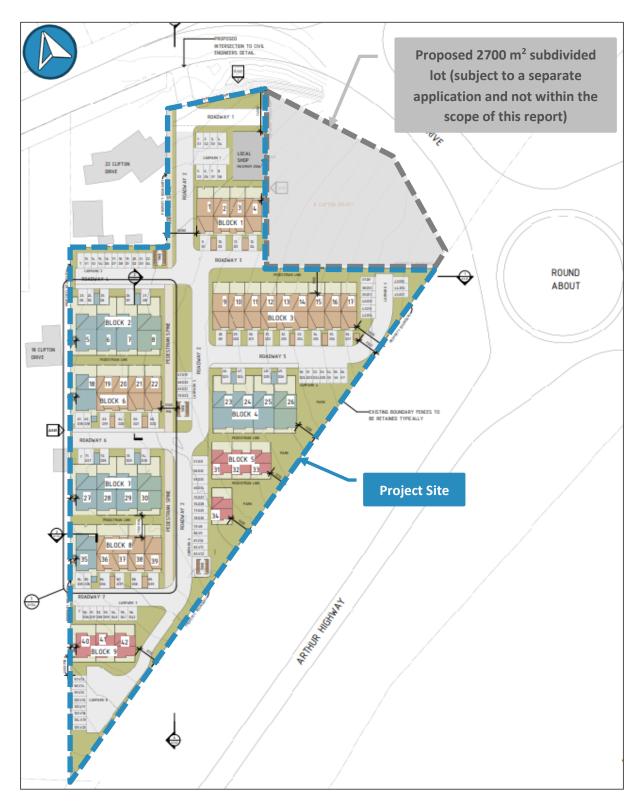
Proposed Site Plan (Image Source: 1+2 Architecture)
